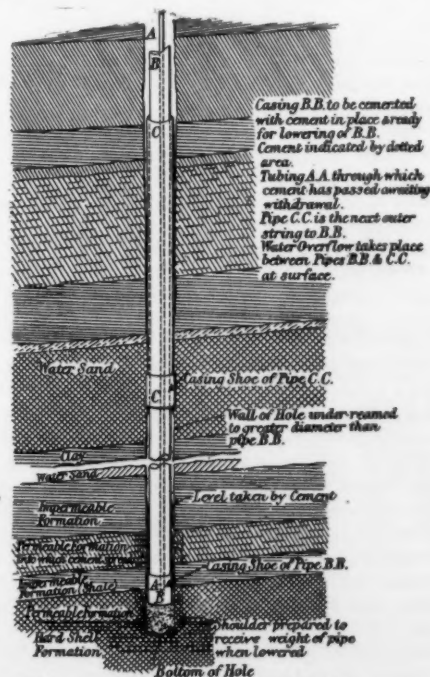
SECTION OF THE BOTTOM OF A WELL
